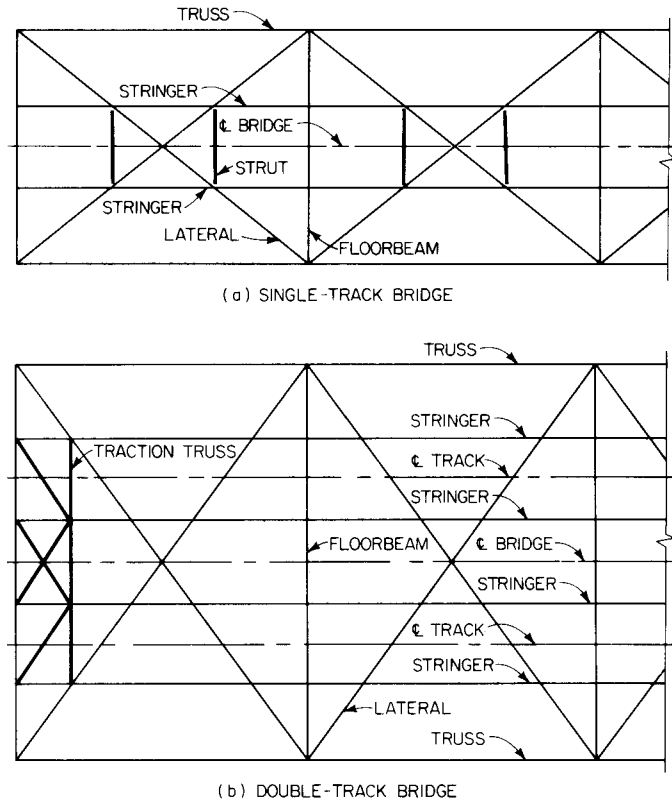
Lateral bracing and traction trusses for resisting longitudinal forces on a truss bridge.
